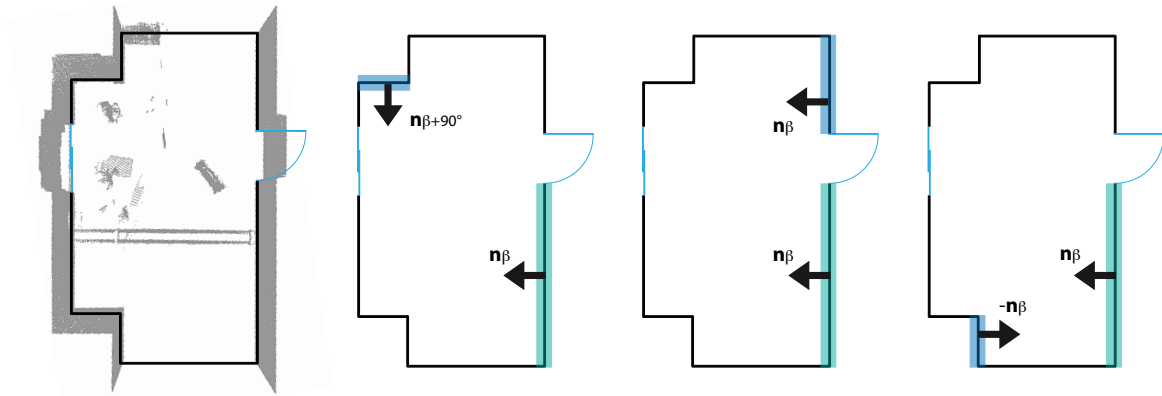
Orientation of the walls in the Manhattan-world domain. From left to right: top view of a point cloud with the related floor plan showing orthogonal walls, walls with the same orientation and walls with opposite orientations.
